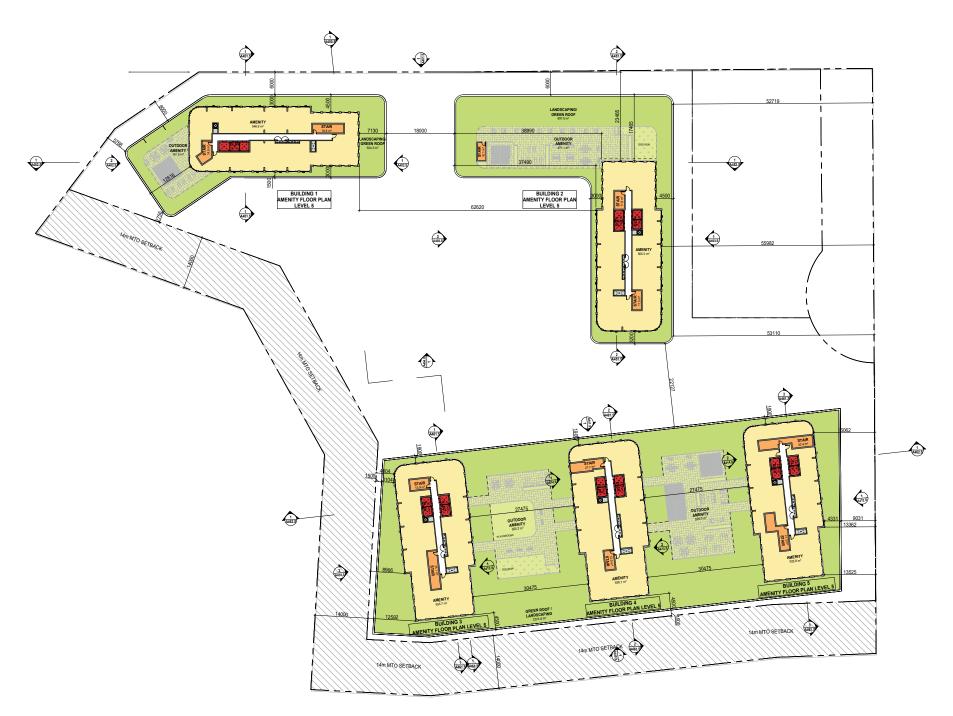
PODIUM ROOF PLAN - FLOOR 5 (BDP. QUADRANGLE ARCHITECTS LTD.)
